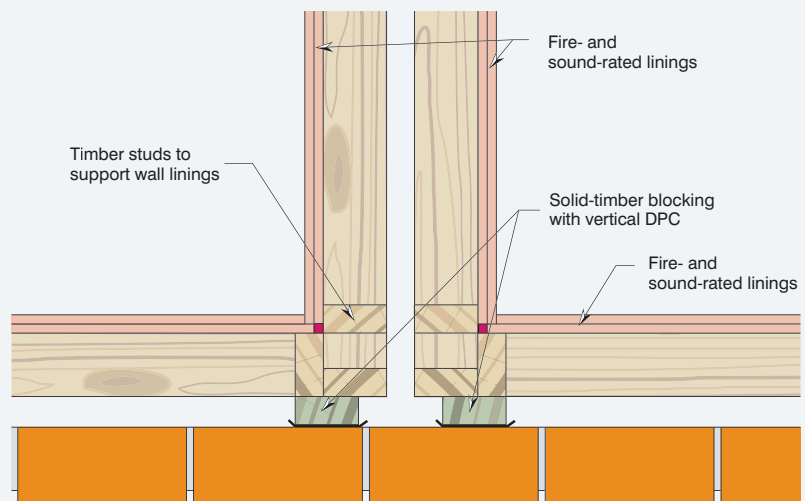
Cavity barrier (using timber blocking) at junction of fire-rated bounding wall and external wall – plan view.
